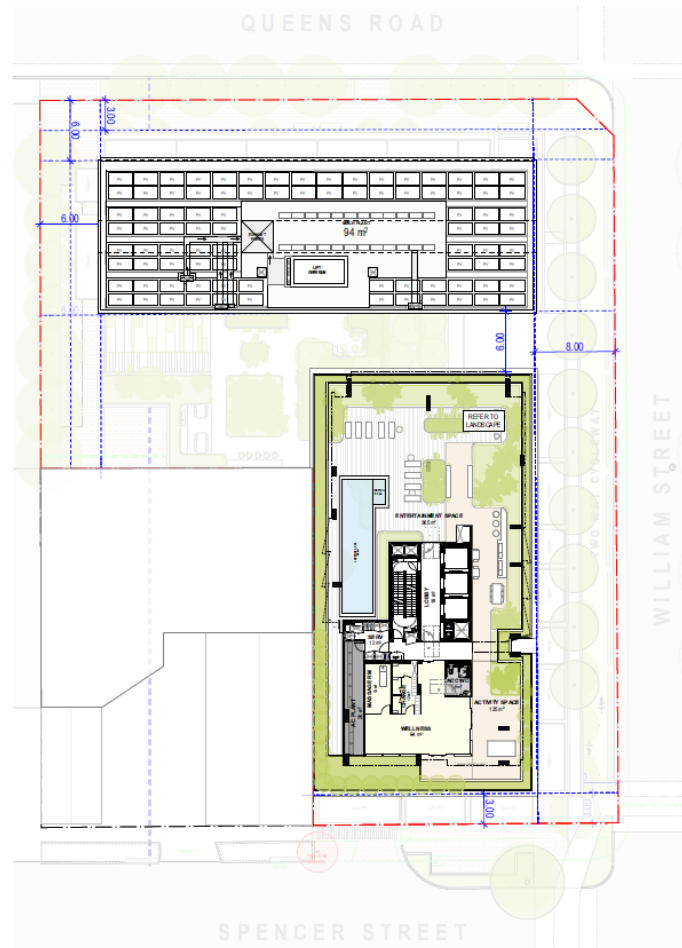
Level 05 floor plan of proposed development (Plus Studio, 2026)
